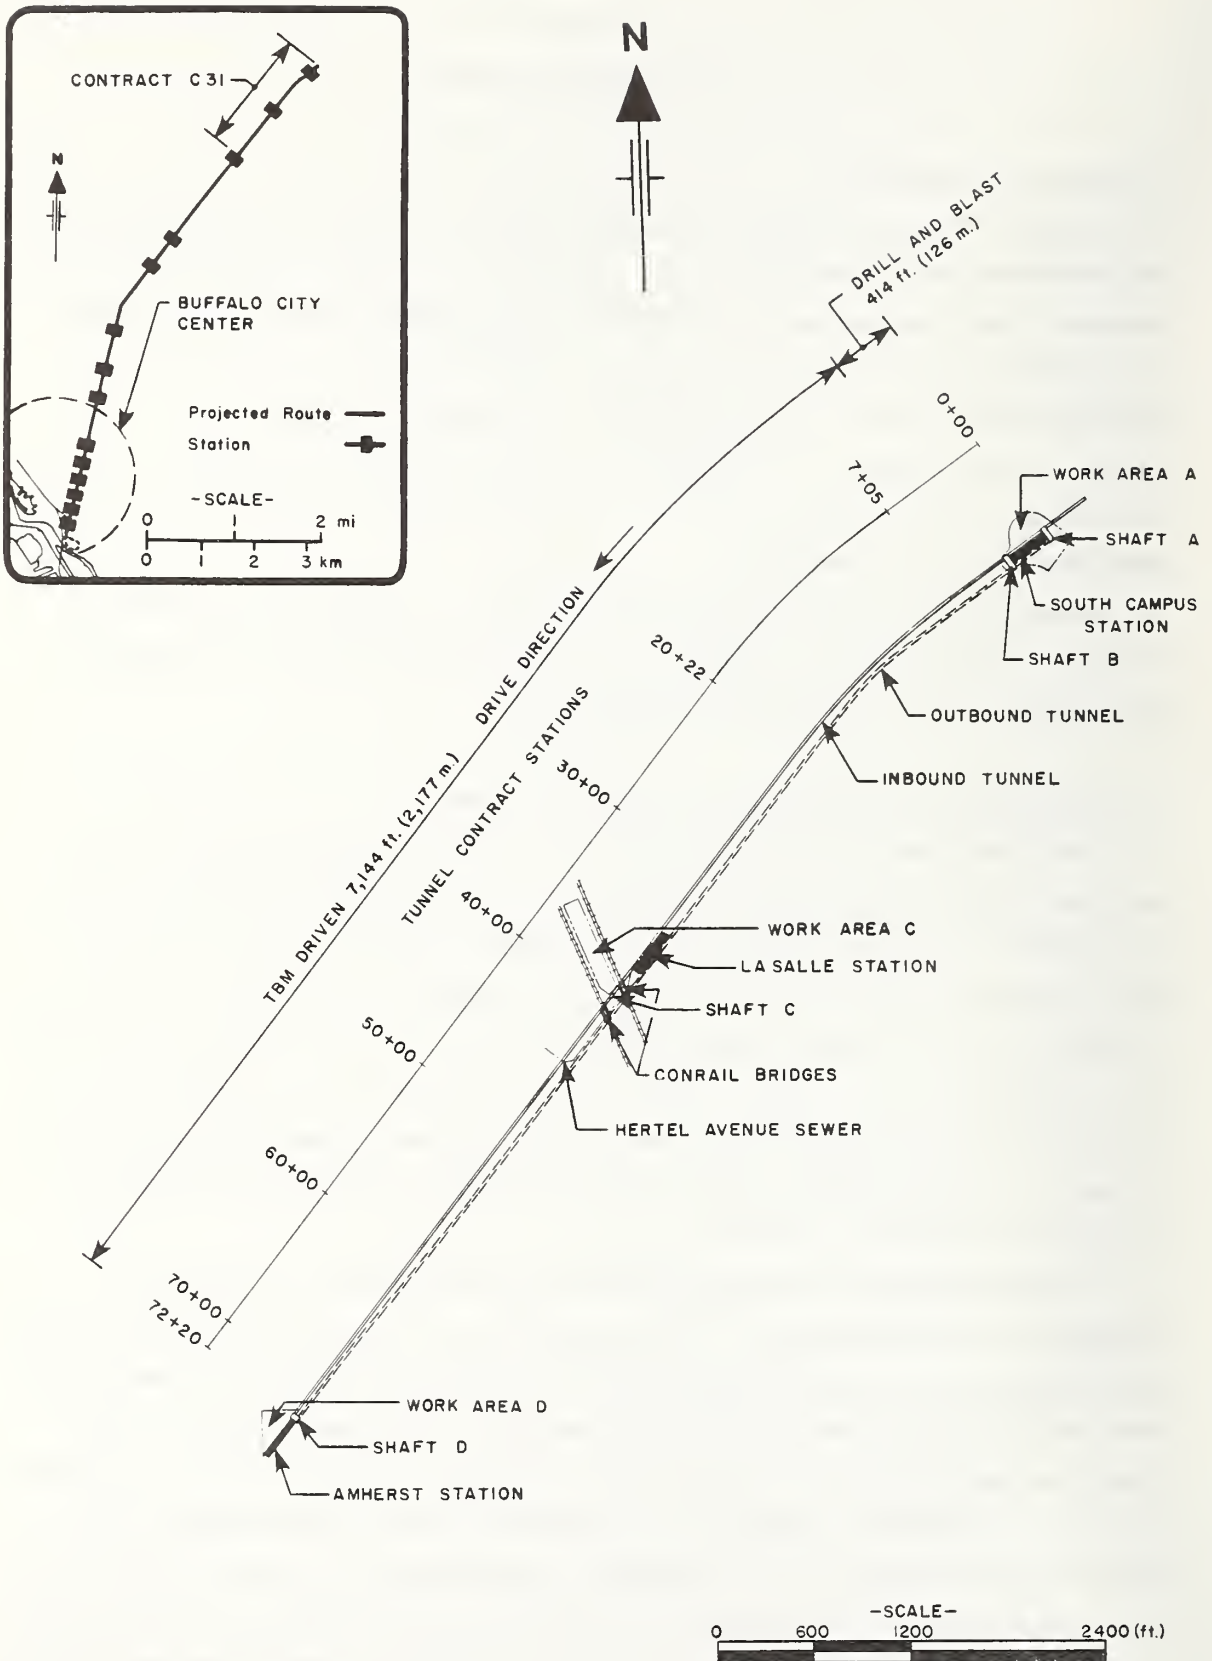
PLAN VIEW OF CONTRACT C31, INBOUND TUNNEL
